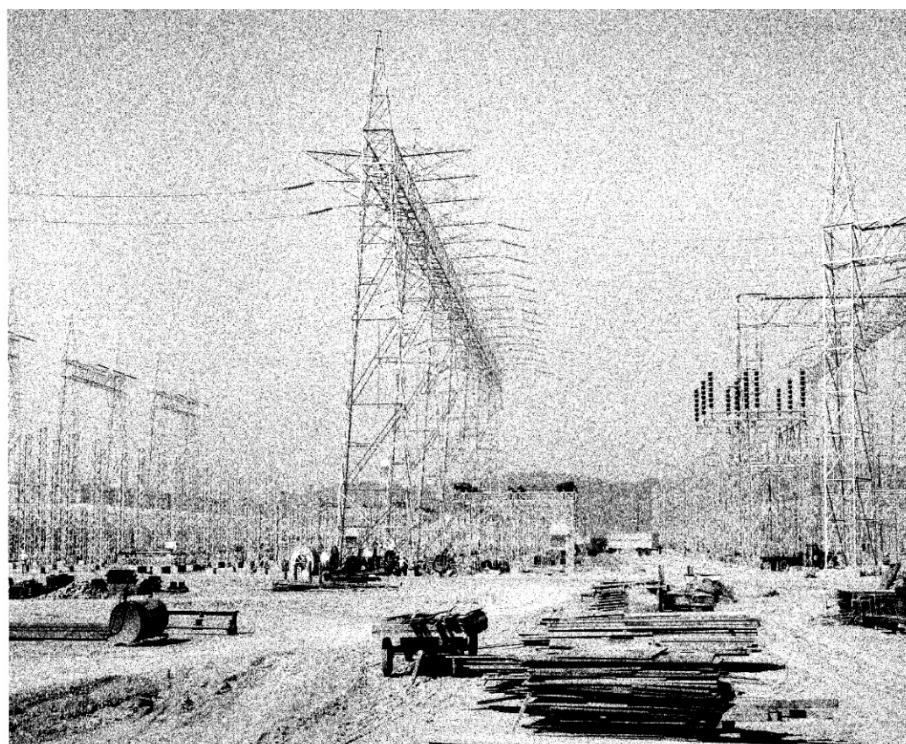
Former X-533 Electrical Switchyard Complex under Construction Looking West (1954)
